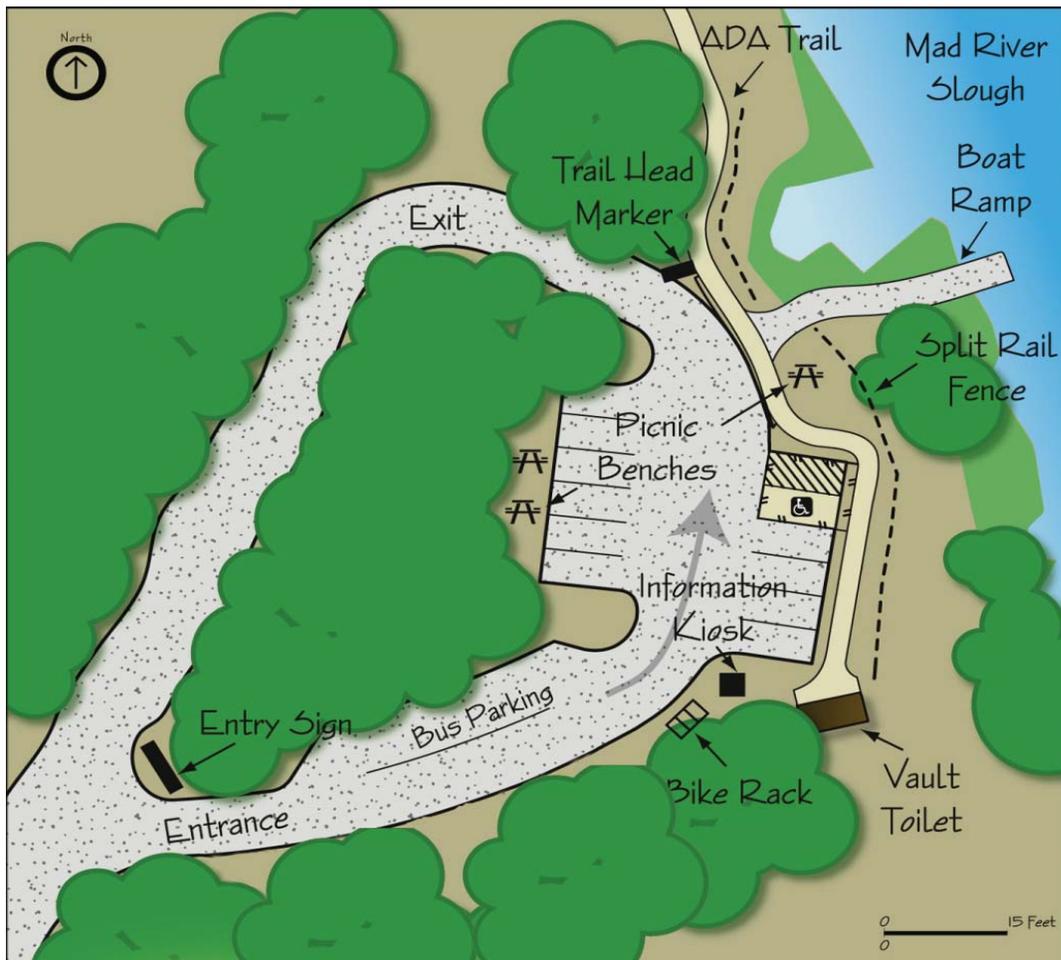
Proposed layout of the Ma-le'l North Parking Area
